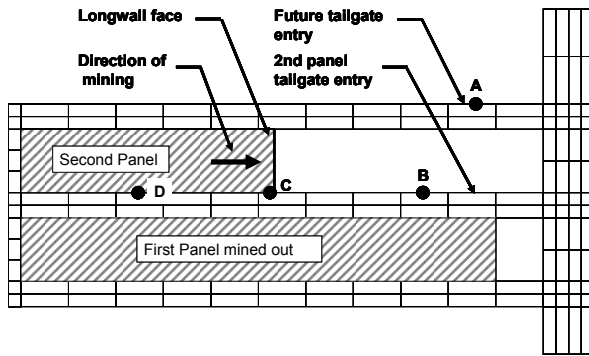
Generalized longwall panel layout indicating the four locations where the ground reaction curves should be determined. The points represent the following loading conditions: A-development, B- side abutment, C-front abutment at the face, and D-full extraction.
